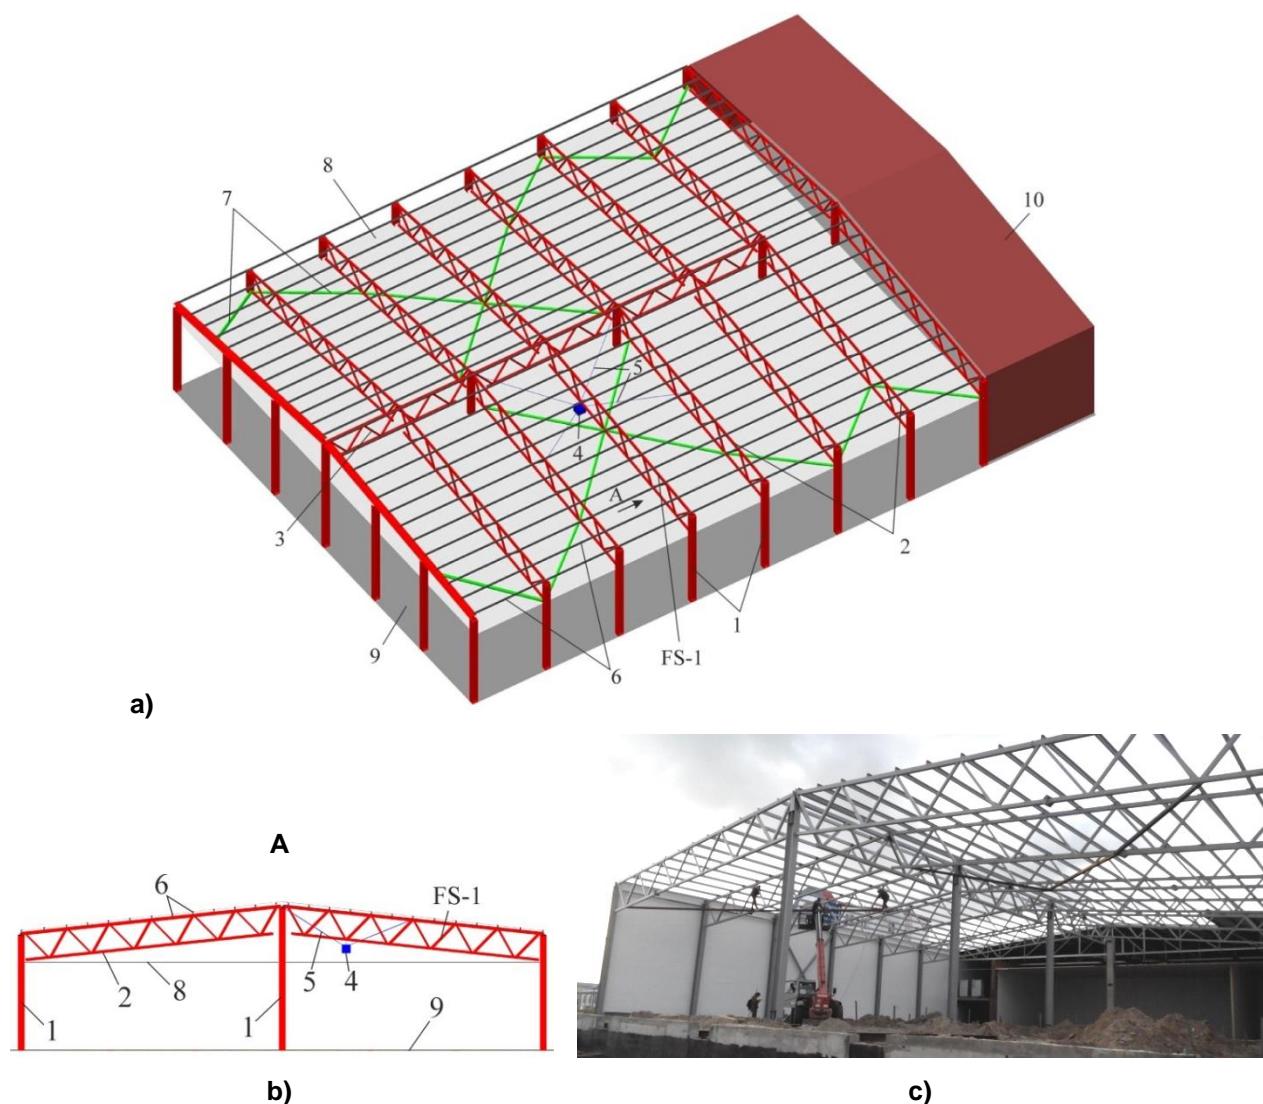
Object of the experiment: a – solid model: 1 – column 2 – roof trusses, 3 – secondary truss, 4 – load, 5 – safety ropes, 6 – girders, 7 – braces on bottom chord of a truss, 8 – suspended ceiling of the sandwich panels, 9 – polymer floor of the shop, 10 – operated additional building;
